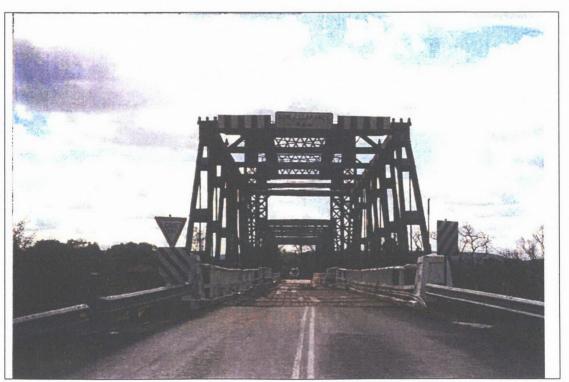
Bridge approach from the south. Note Telstra Cables to the bottom right of photo.
